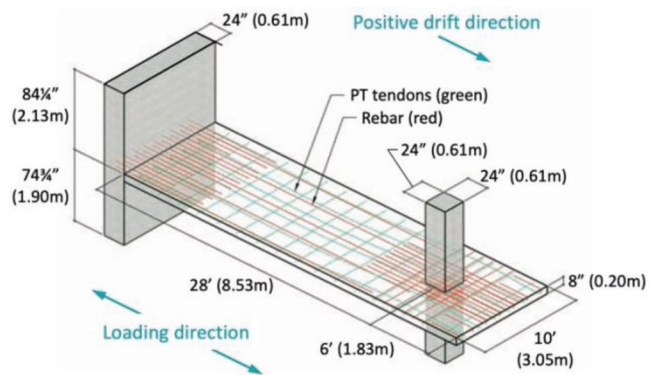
Isometric view of test specimen (adapted from Klemencic et al. [2006]). (Full-color PDF can be accessed at www.concrete.org.)
